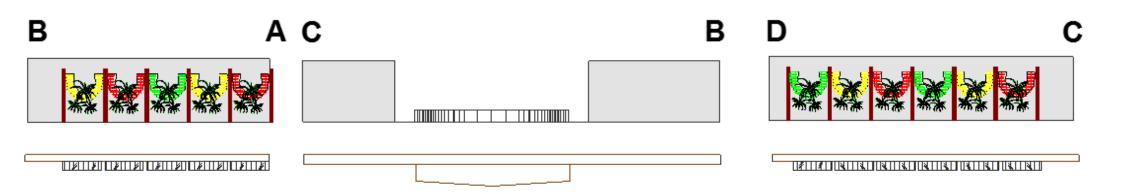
PROPOSED PARAPET WALL DESIGN
